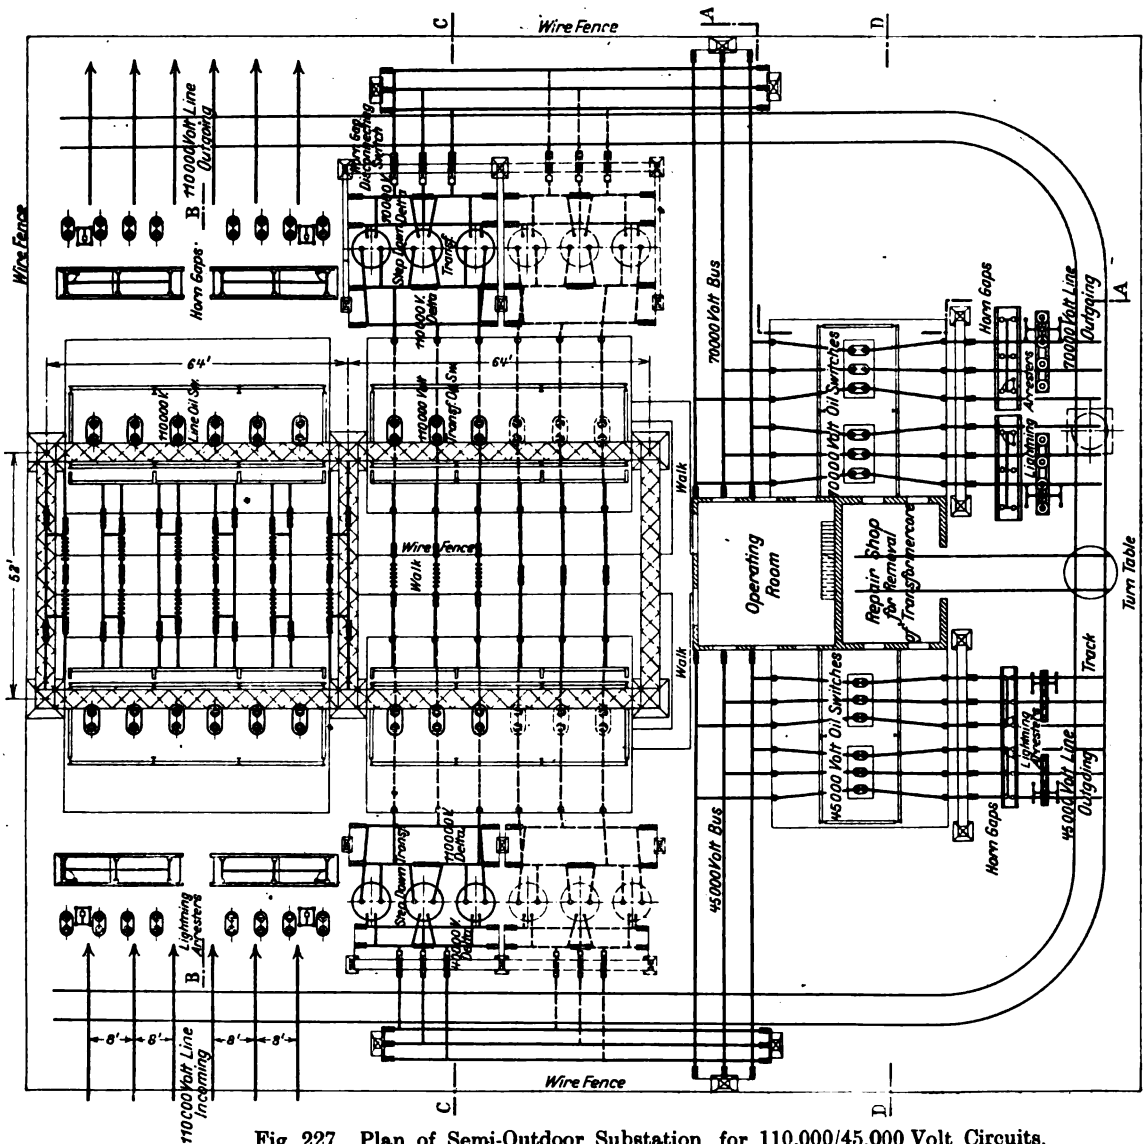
Plan of Semi-Outdoor Substation, for 110,000/45,000 Volt Circuits.
